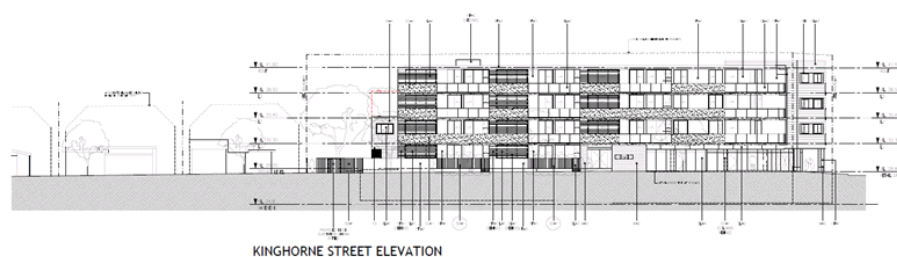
Elevations of the proposed development (eastern elevation – Kinghorne Street).
